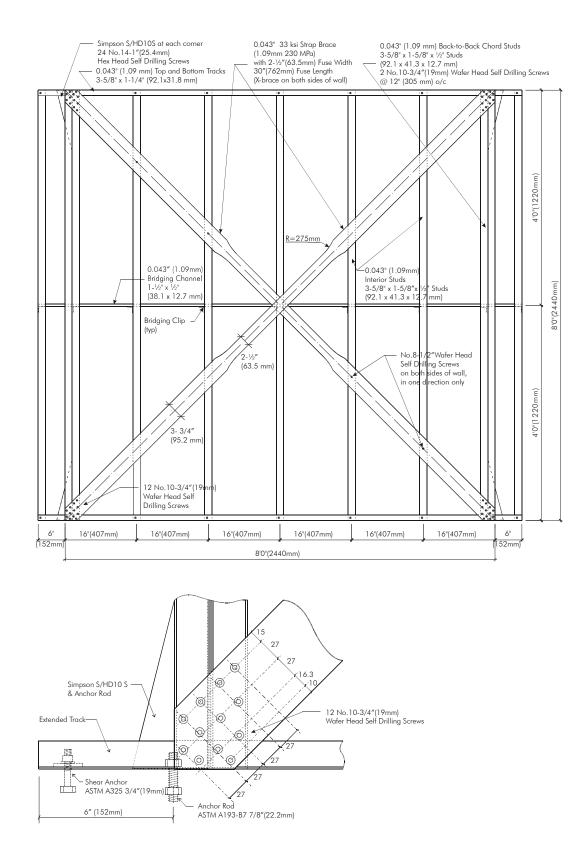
Nominal dimensions and the corner detail of specimens 25A-M and 26A-C
